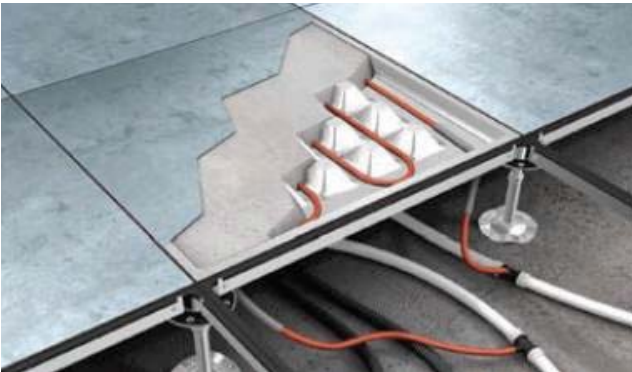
, 3 . Details of the project: all aspects are included, roof insulation, strengthening and electrical cable path, vent and floating heating floor
